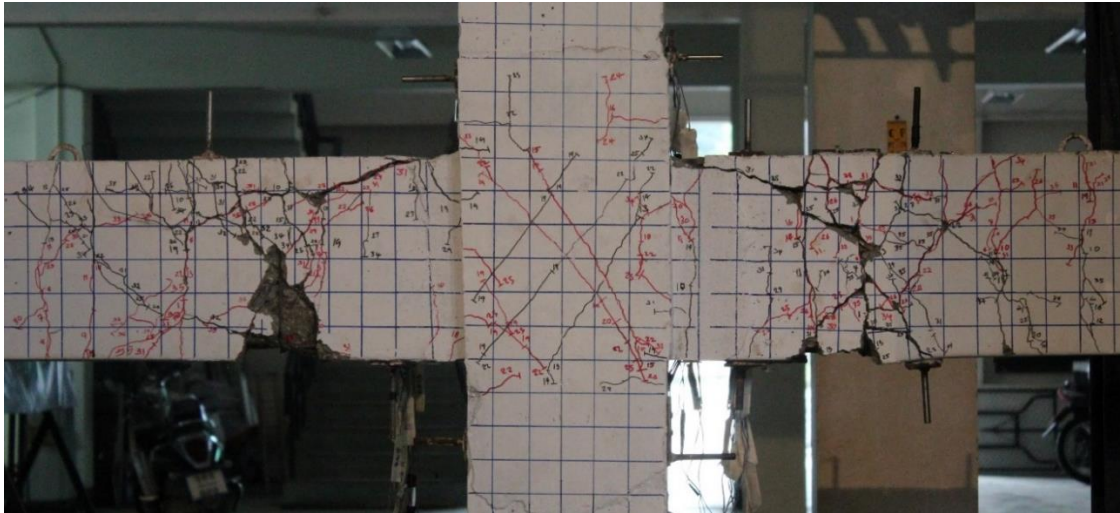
Crack distribution of precast specimen P6 at the end of testing
